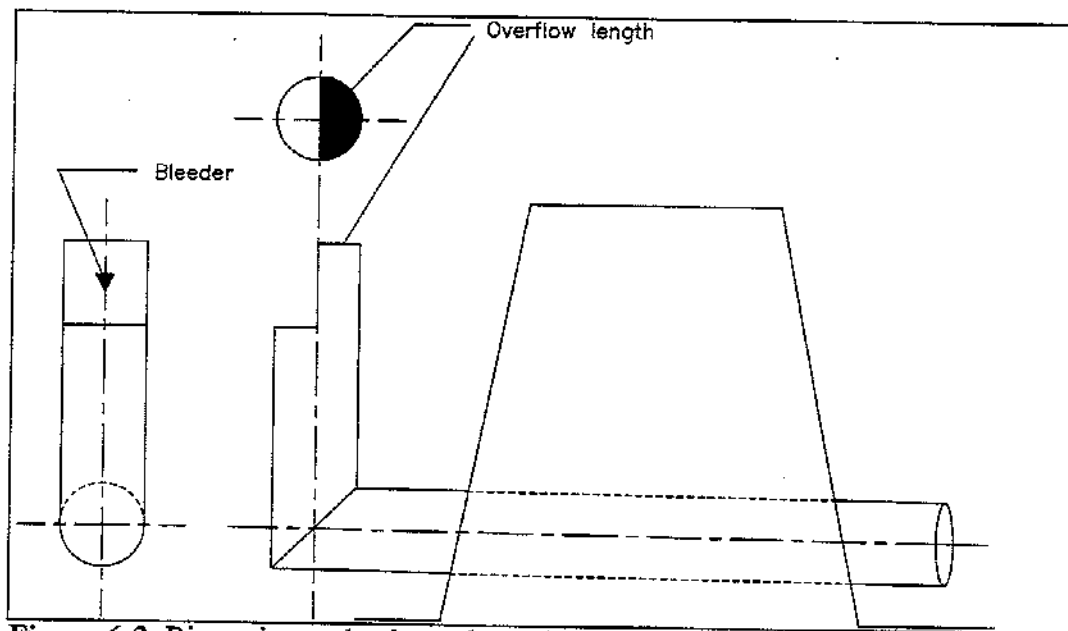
Riser pipe and culvert through an embankment. The riser pipe has a semi-circular overflow section and a bleeder on the upstream face.
